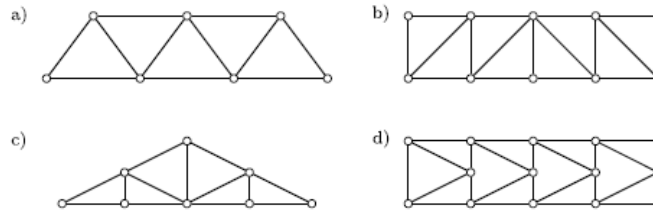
Example of trusses: a) V-truss, b) N-truss, c) Roof truss, d) K-truss
